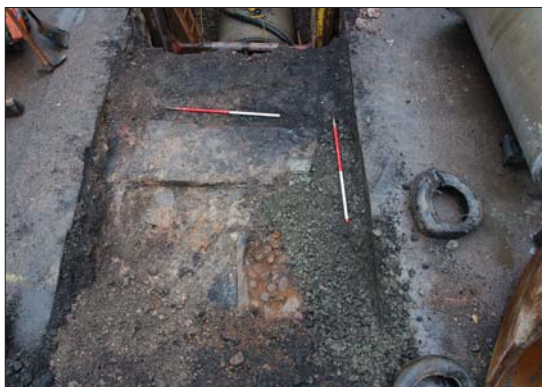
Sea wall 065, cobble 066 and degraded paved and mortar floor 067, from the south-west
